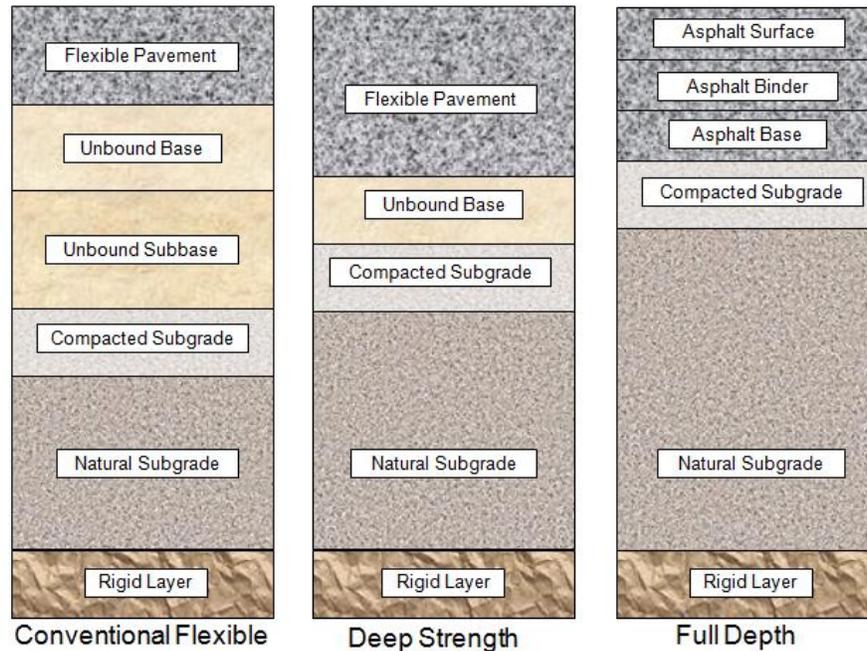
Asphalt Concrete Pavement Layer Systems
